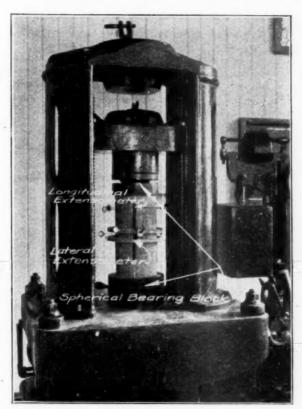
Specimen in Testing Machine Showing Longitudinal and Lateral Mirror Extensometers,
